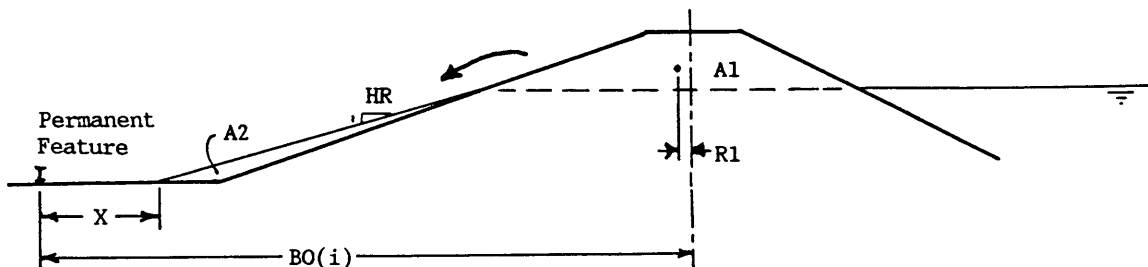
Case 1 Cross Section: Strike Dam to Outside
